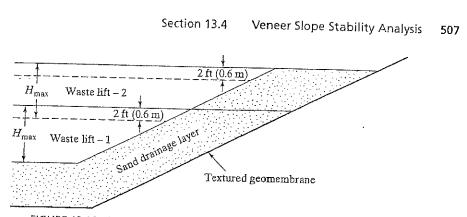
Incremental Placement of Soil Drainage Layer on Sideslope
